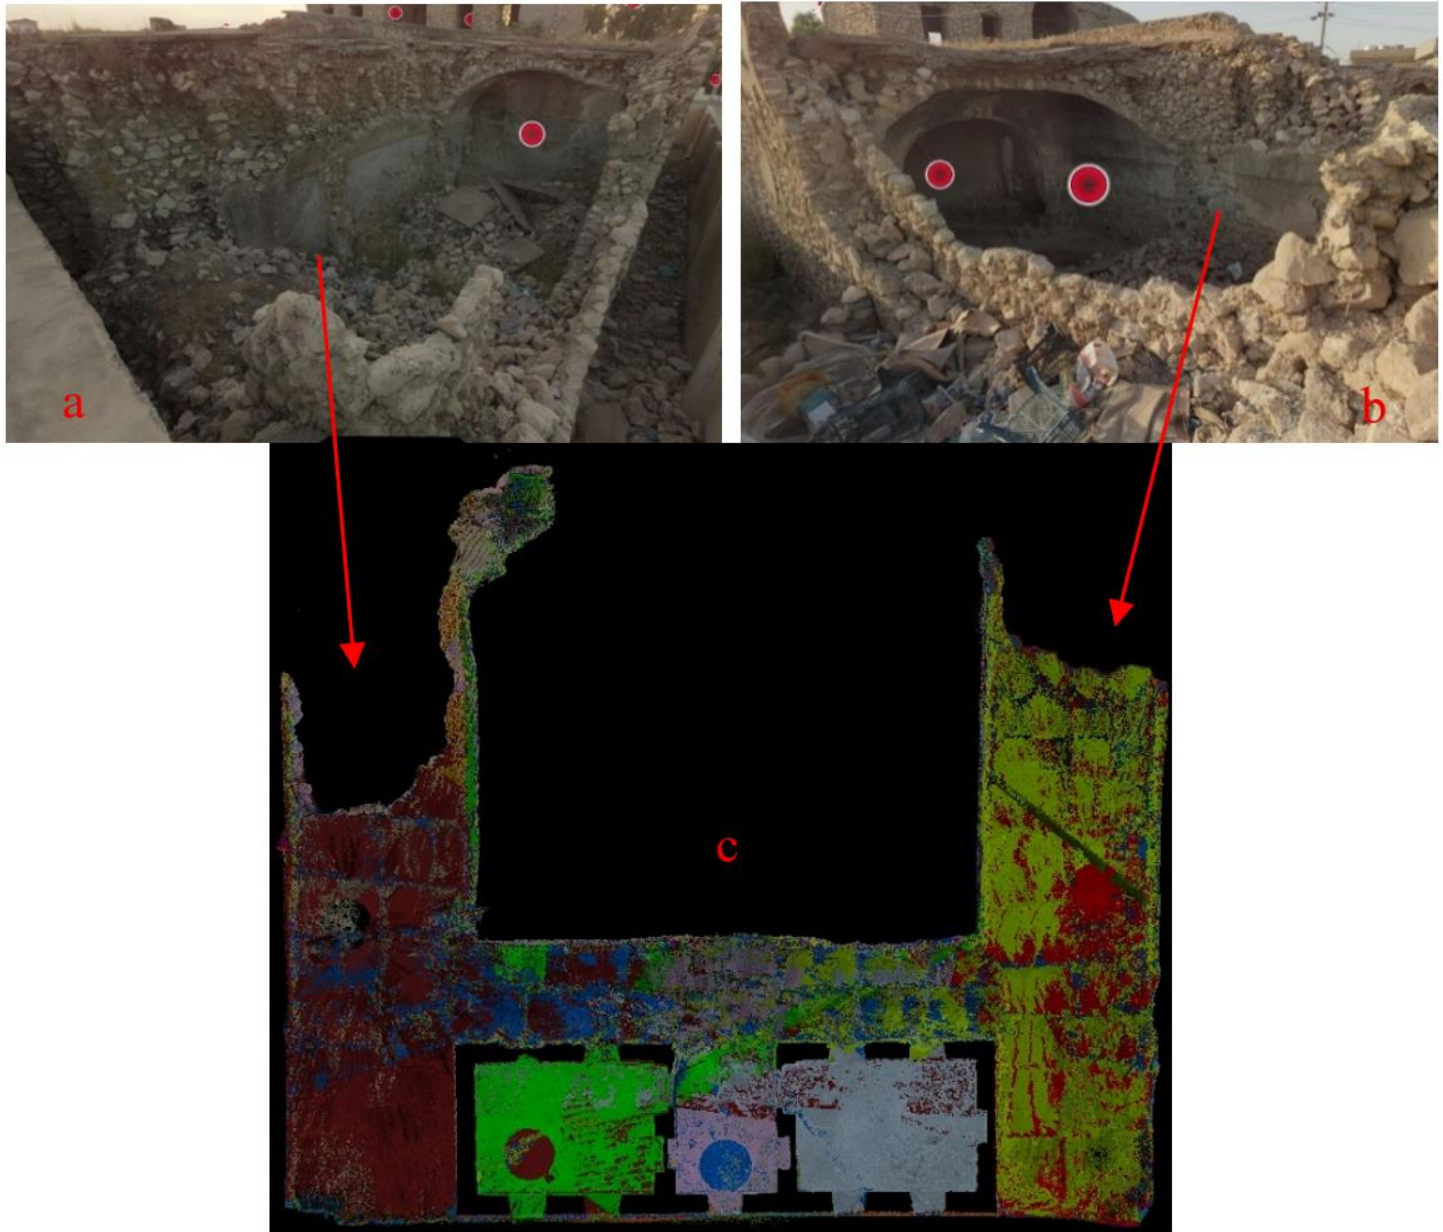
Collapsed part of the Gwer Caravanserai: a) Back right side collapsed ceiling, b) Back left side collapsed ceiling, and c) Top view ceiling section to show the collapsed part.
